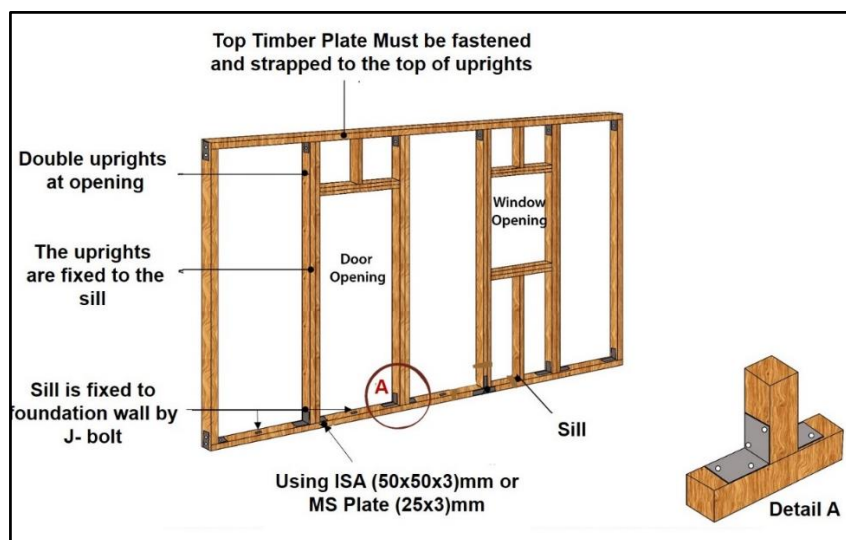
(A) CONNECTION DETAILS OF TIMBER WALL FRAME
